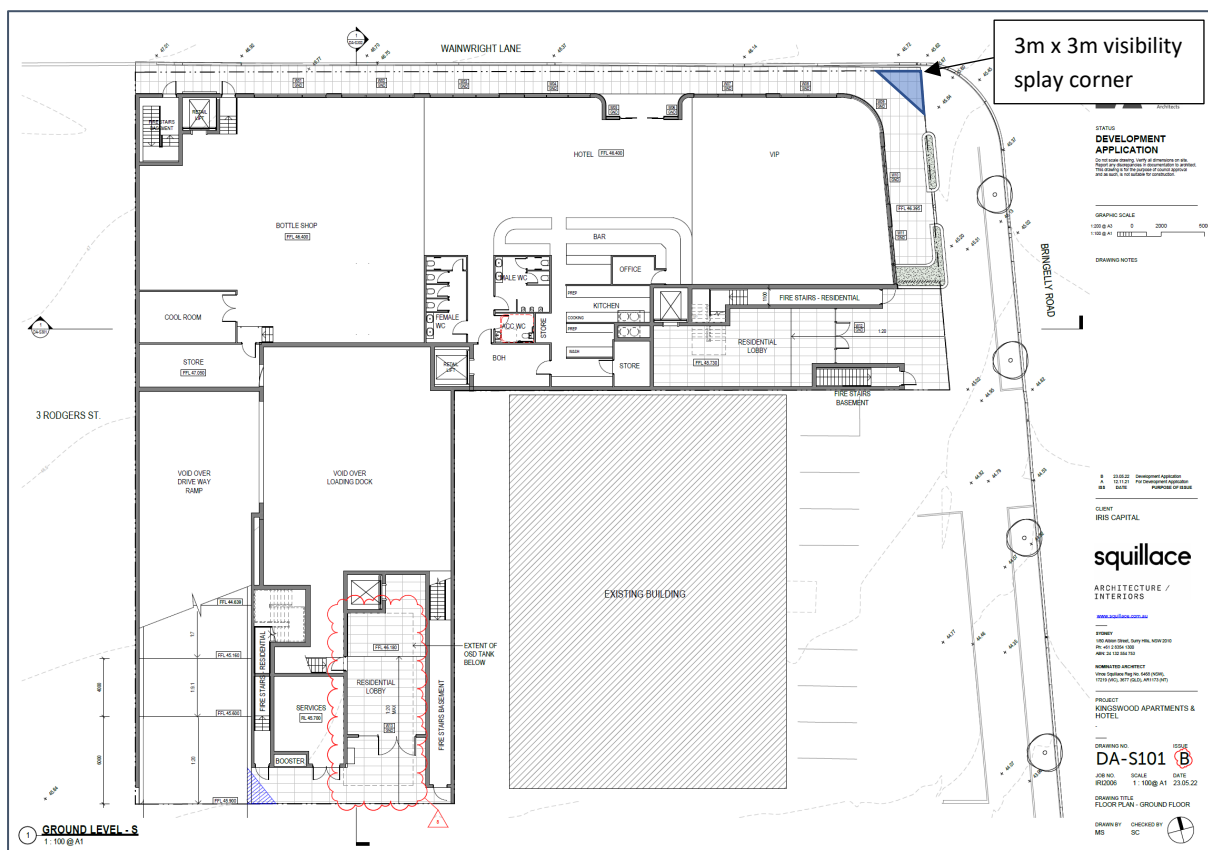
Southern Building Bringelly Rd & Wainwright Lane 3m x 3m splay corner
